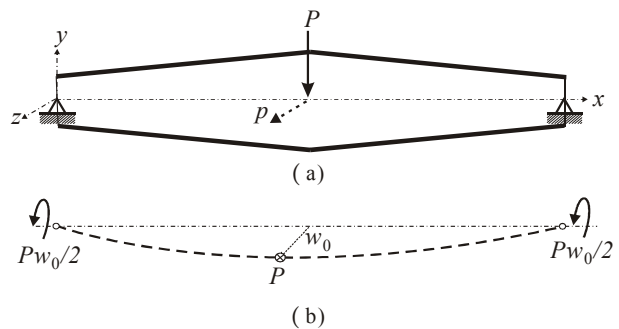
Web-tapered I-beam with a centroidal loading: (a) elevation; (b) plane on longitudinal axis.
